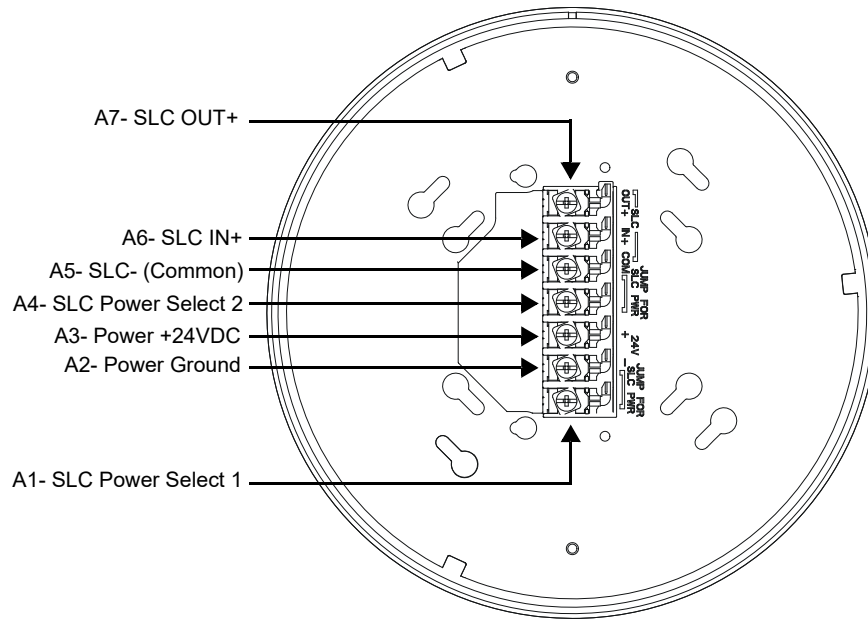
TRW-GI Mounting Plate - Terminal Layout
